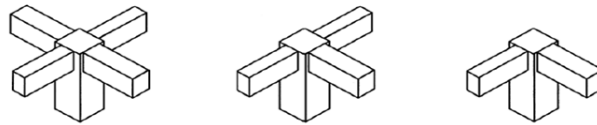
(a) Interior joint (b) Exterior joint (c) Corner joint
